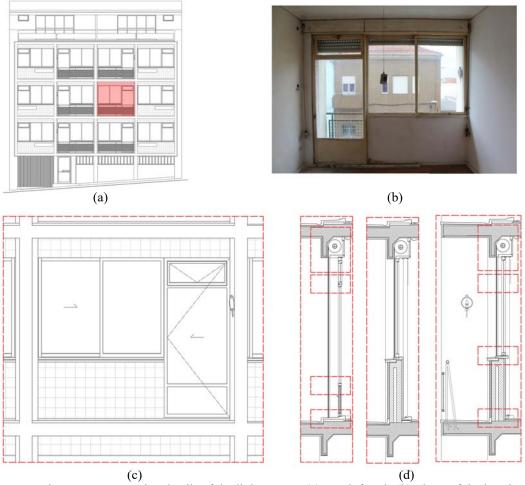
Constructive details of the living room: (a) South façade (b) Photo of the interior of the living room (c) Living Room facade 1:50 (d) Vertical Sections 1:50.
